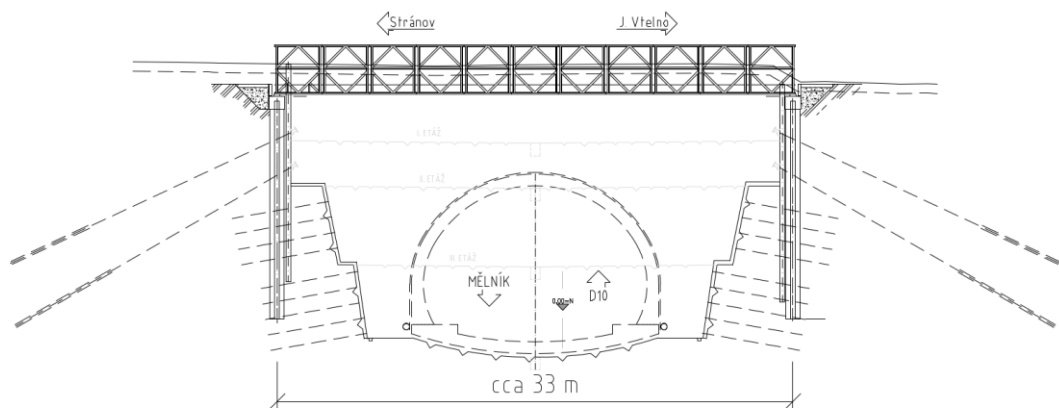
Cross-section through the excavation at the temporary bridge location (Amberg Engineering Slovakia, s.r.o. 2015)
